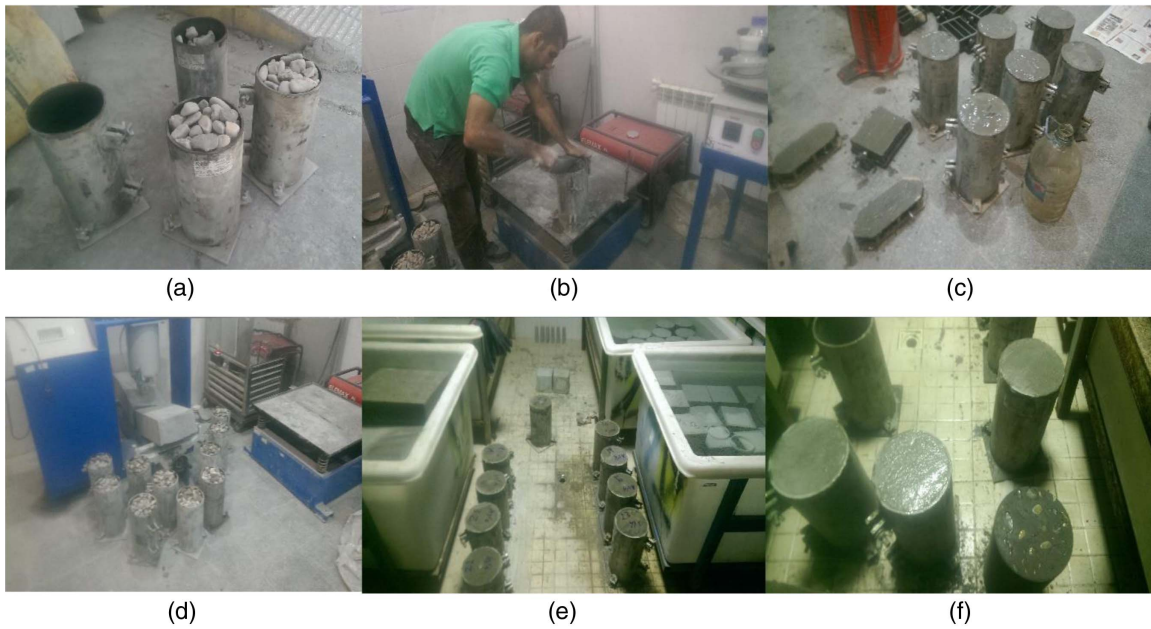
Casting process of TSC specimens: (a) molds filled with gravel; (b) molds prepared for mortar; (c) adding mortar into the mold on the shaking table; (d) curing; and (e and f) completion of the casting process.
